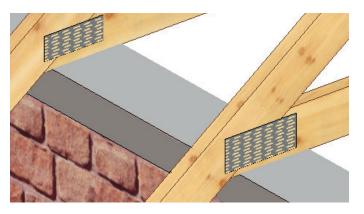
Supporting the truss on a wall using ACRL10520 angle brackets
